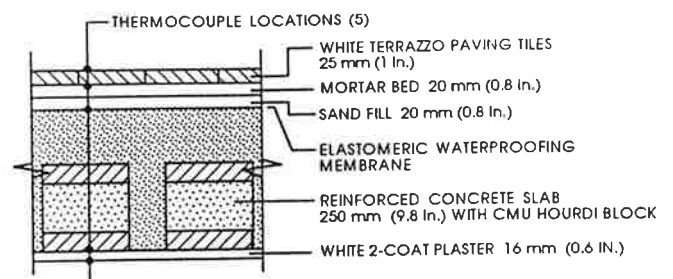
Roof 6: uninsulated hourdi-block concrete slab.
